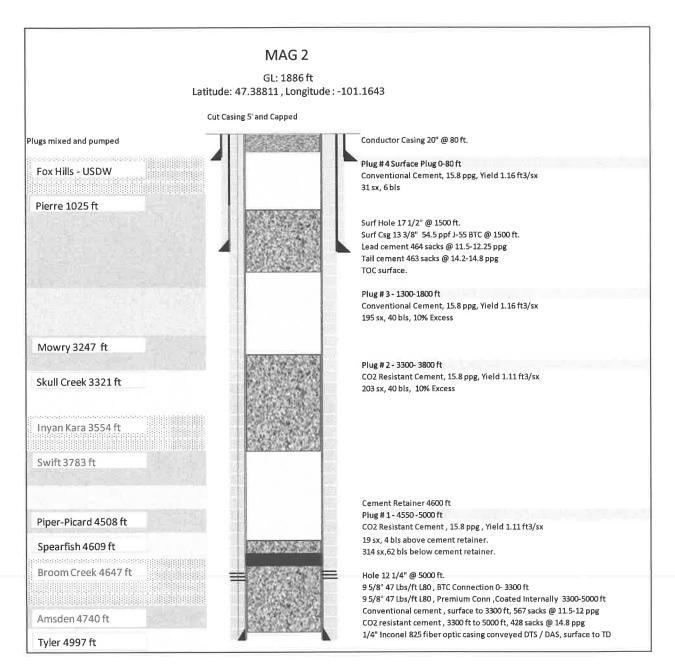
Schematic of proposed abandonment plan for monitoring well MAG 2.
